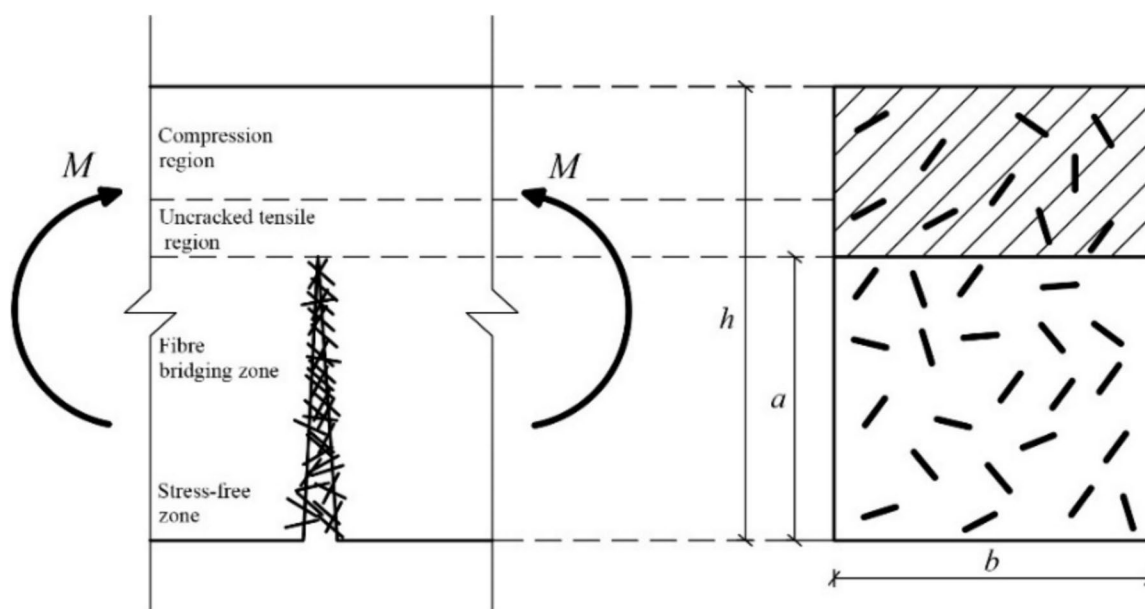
Interaction between the two crack faces in a fibre-reinforced concrete (FRC) beam: Side view and cross-section
